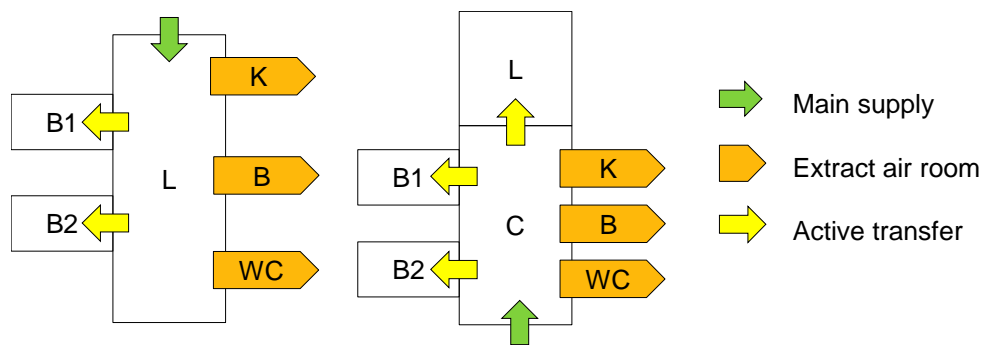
Two types of floor plans, well-adapted to ventilation concept with active transfers.
